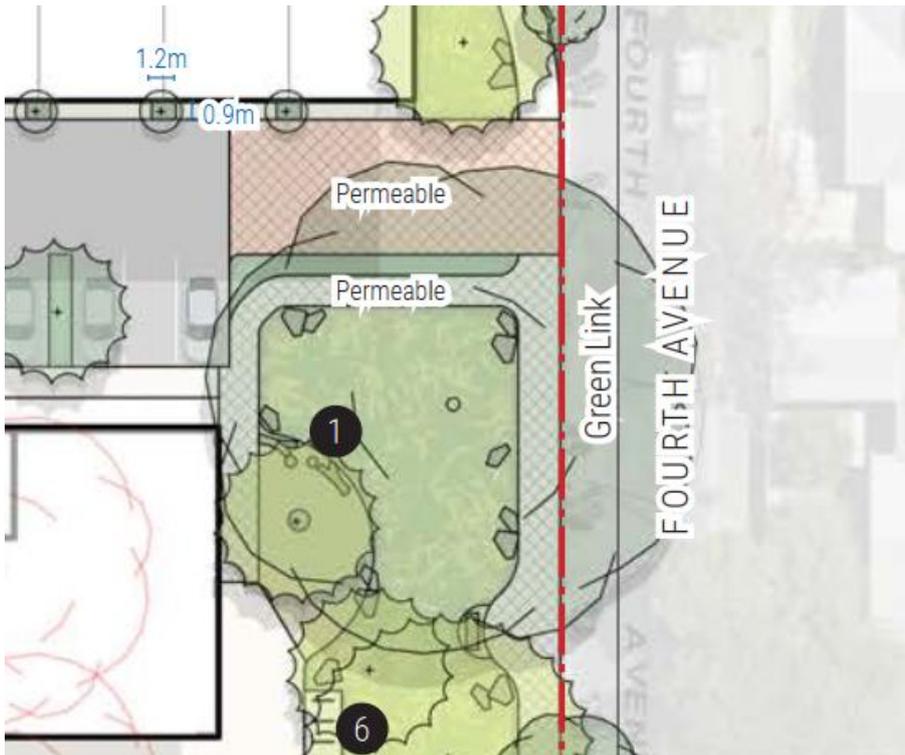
Extract of Landscape plan showing permeable paving around tree 'S6'
